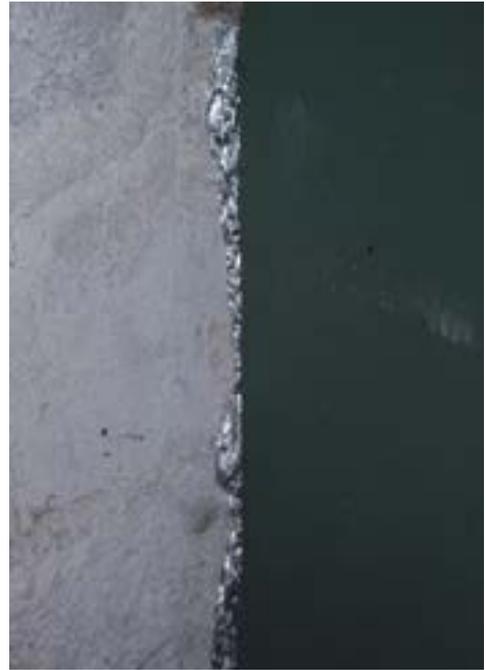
Foil in gaps between south stone wall and west partition wall, 2011.
